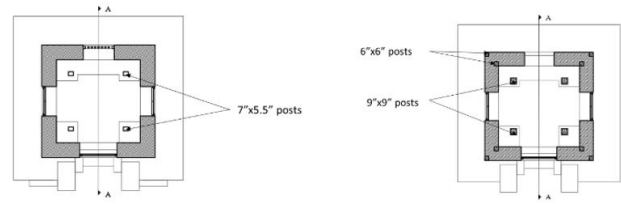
Ground floor plan old (left) and new (right) showing additional posts for reinforcement
